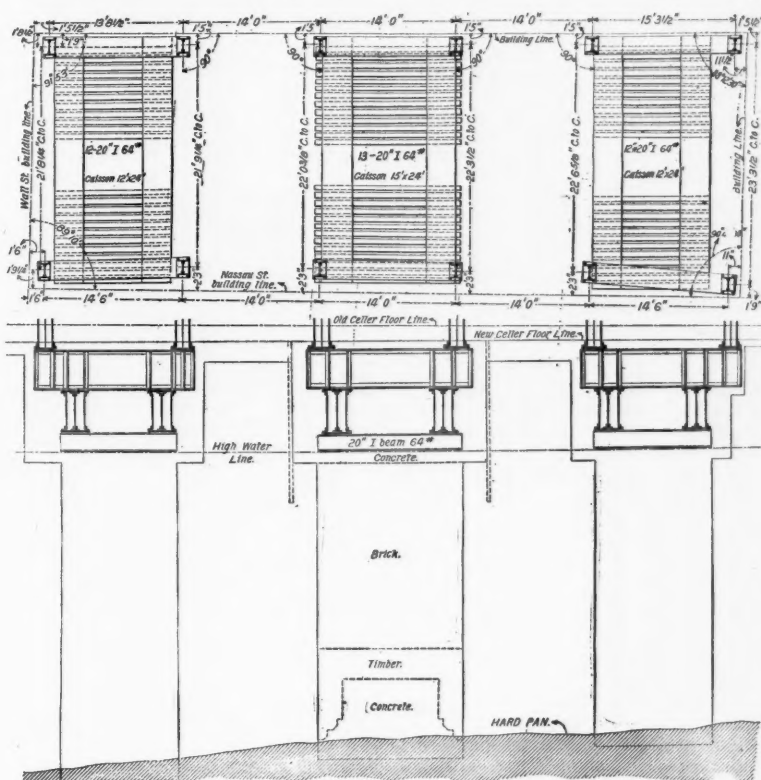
Plan and Longitudinal Section of Foundations—Gillender Building
